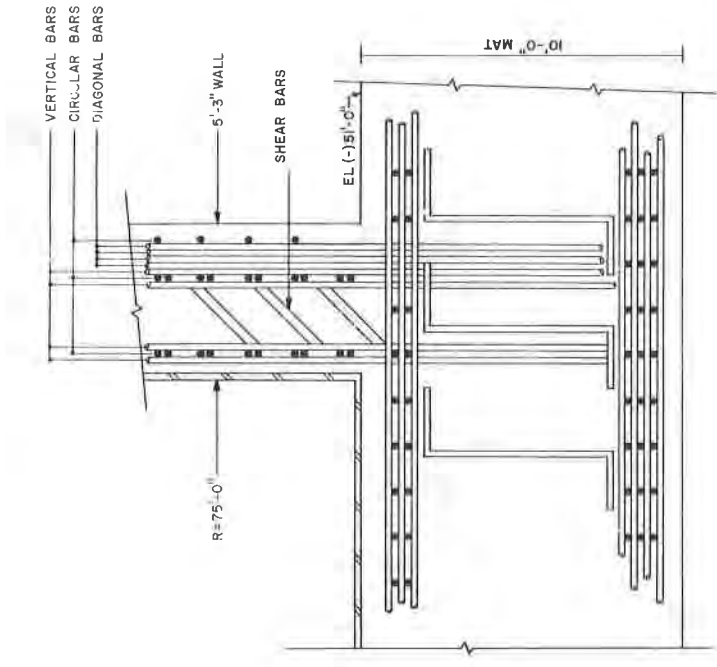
Typical Detail of Containment Wall to Base Mat Junction
